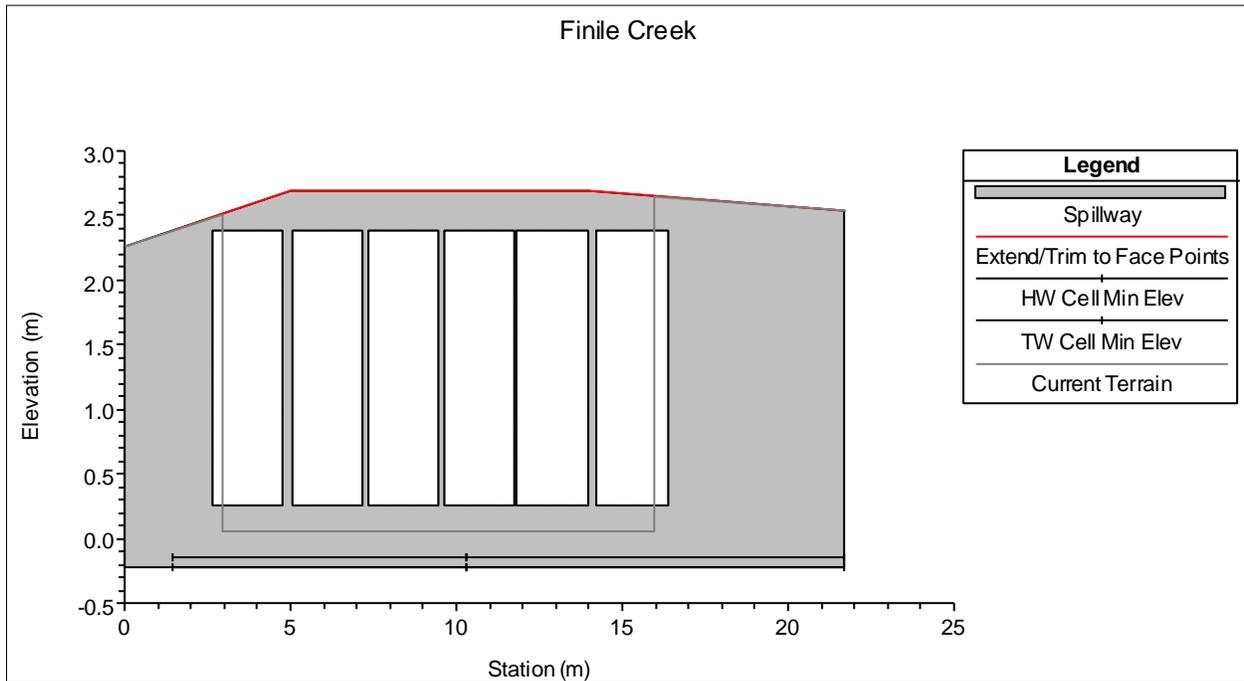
Alt1, Finile Creek, Culvert improvements at Rt 2 highway road
